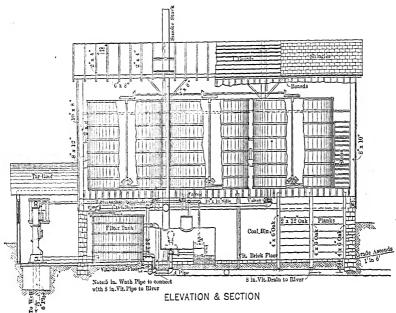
Intermittent water softener for railroad water station, elevation and section.
